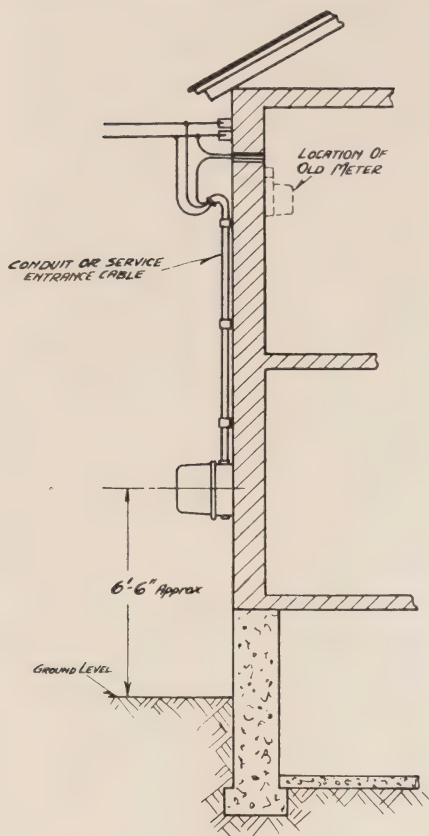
Type "CS" meter installation using existing entrance at the top floor of the building.
